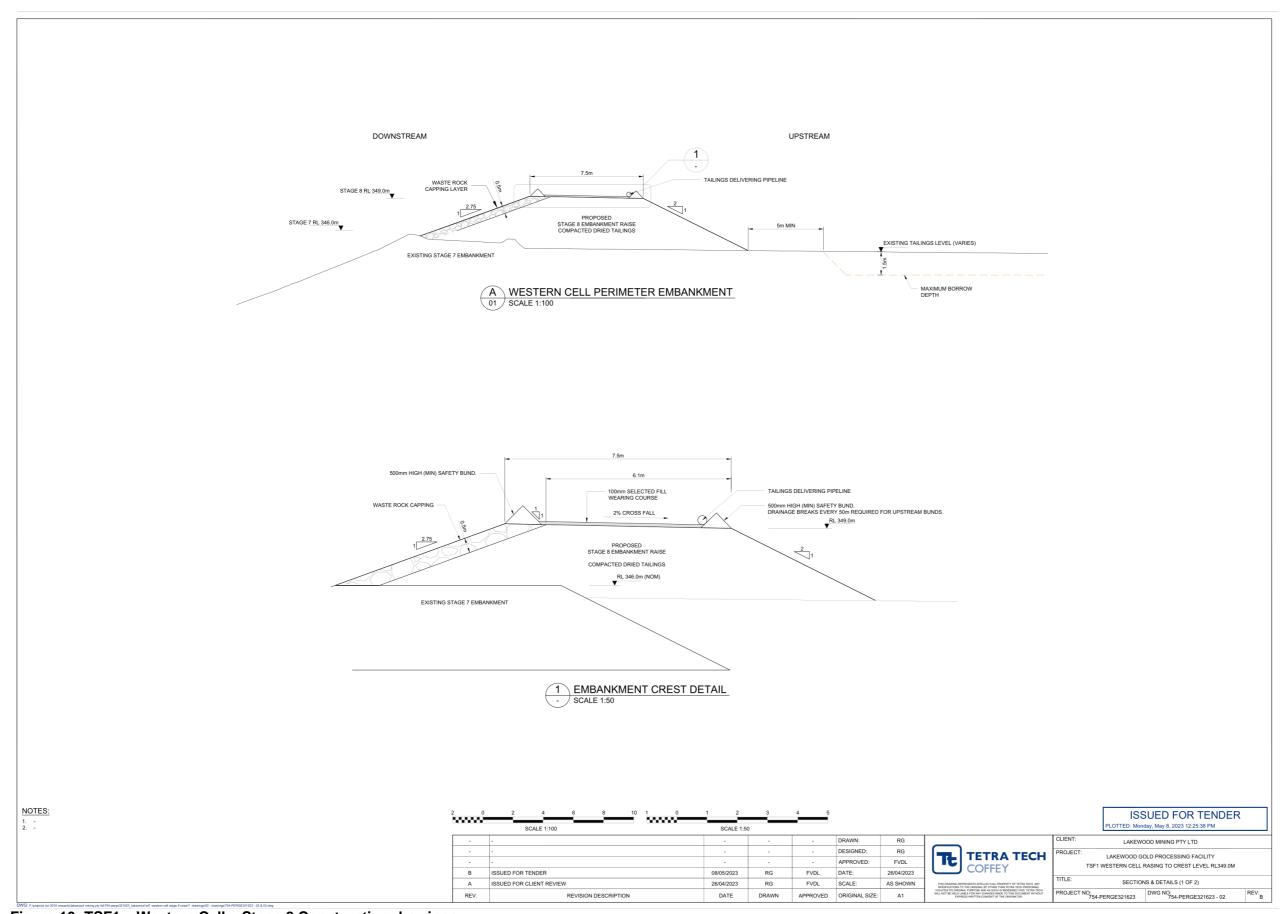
TSF1 – Western Cell – Stage 8 Construction drawings
